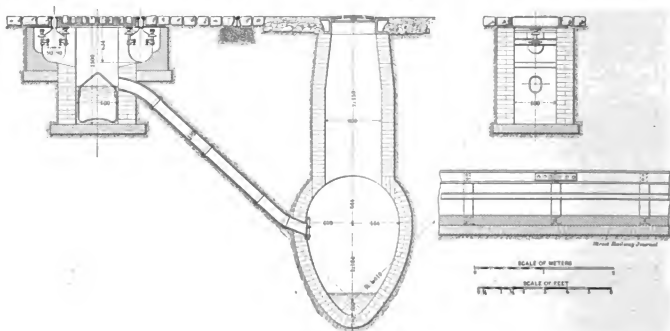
SECTION OF CONDUIT AT A MANHOLE
